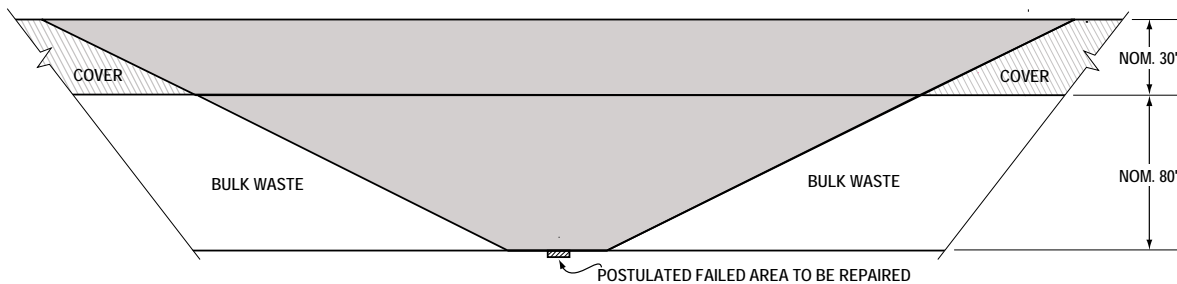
Depiction of Excavation Required to Repair Postulated Failed Area at Center of FWF-NCDU
